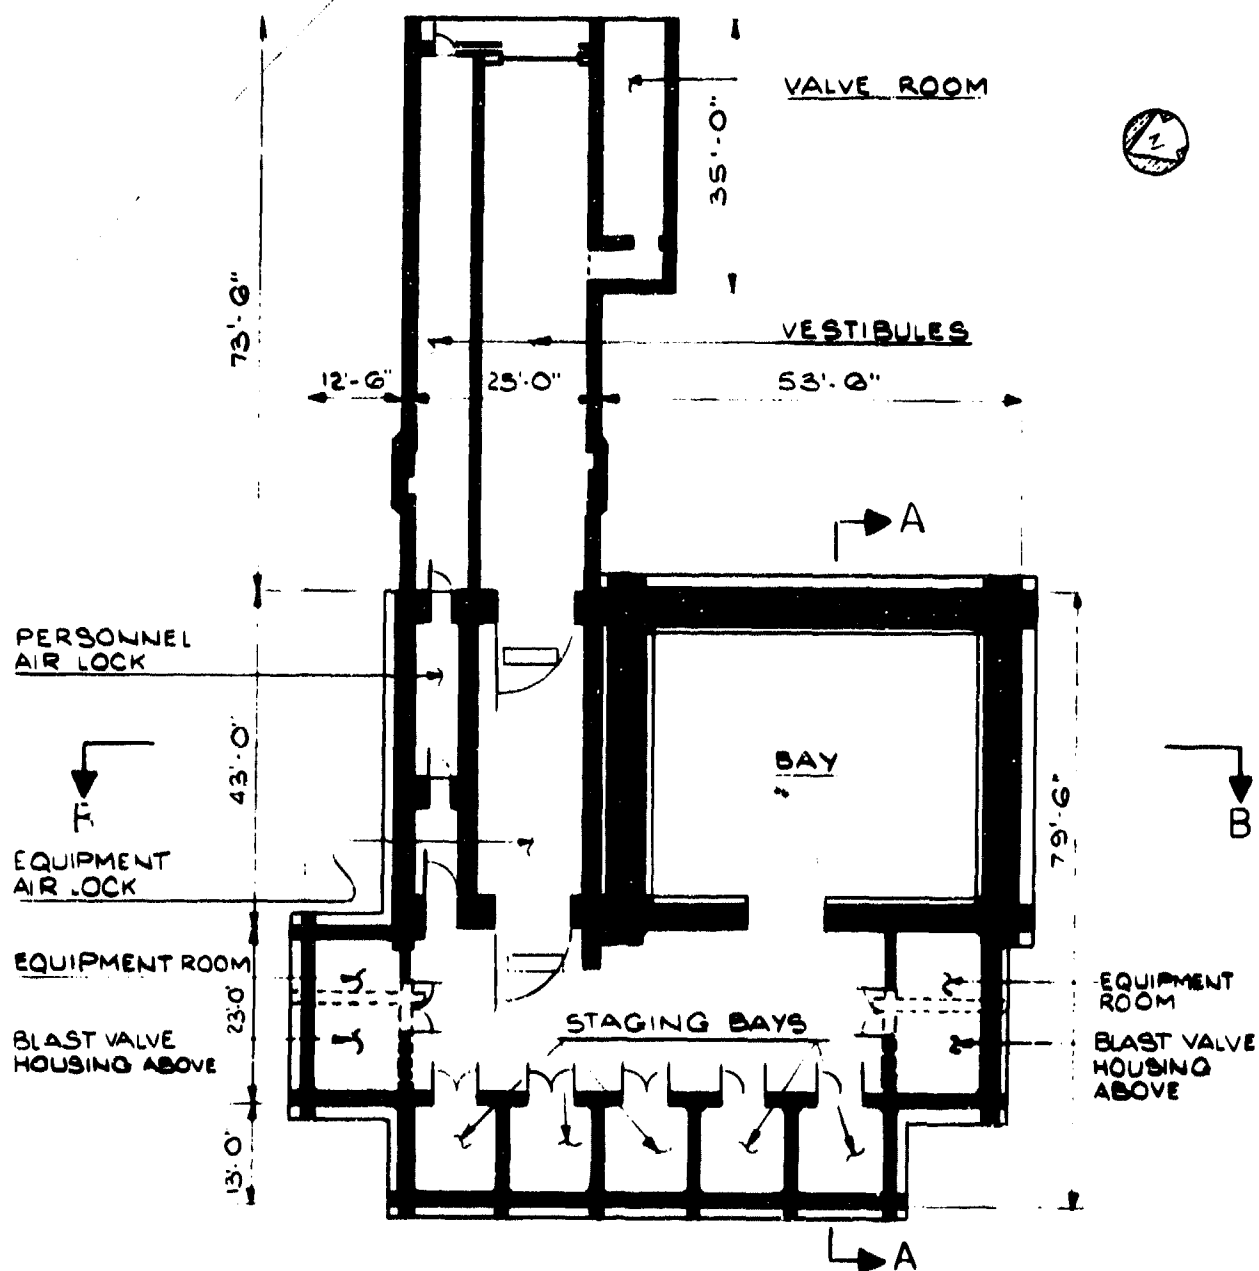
DAMAGED WEAPONS FACILITY (FLOOR PLAN)
